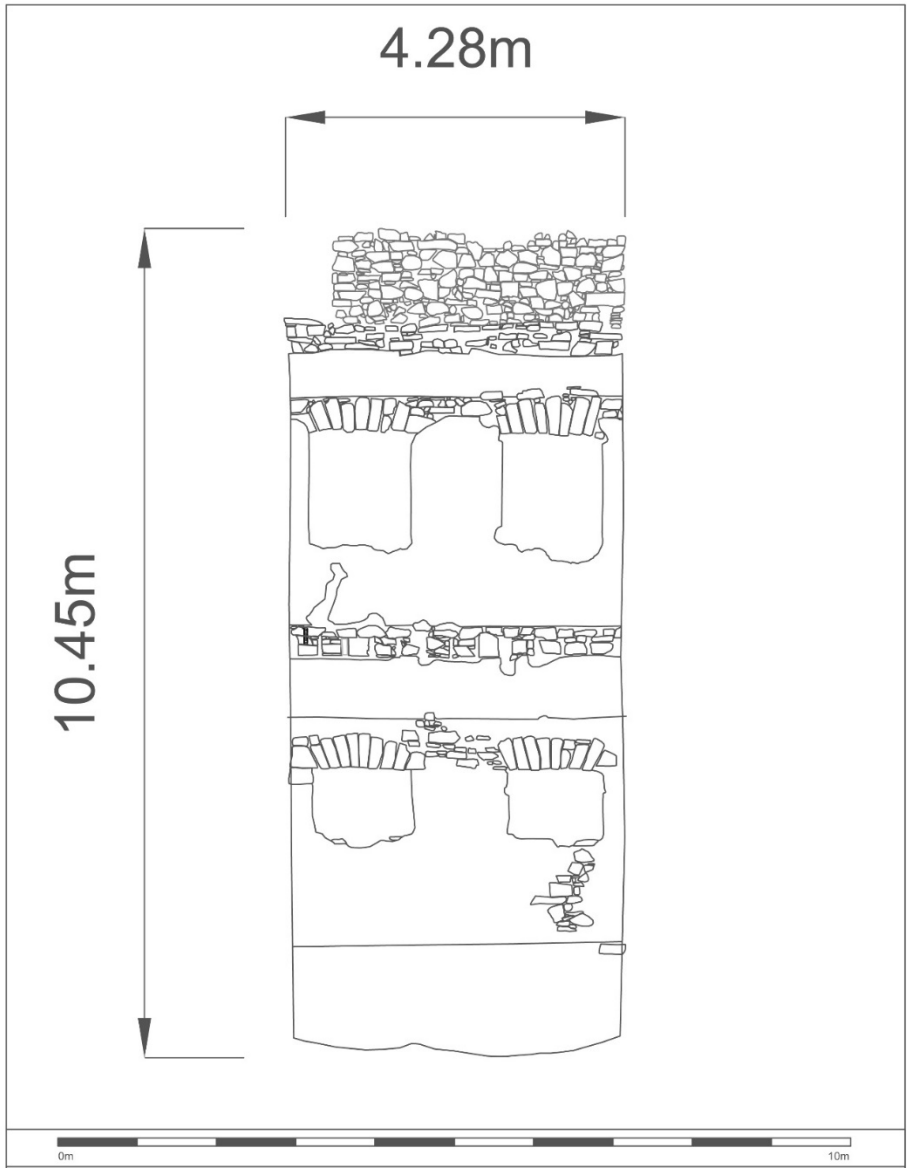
Internal elevation of the south-west wall of the signal tower at Crohy Head Signal Tower.
